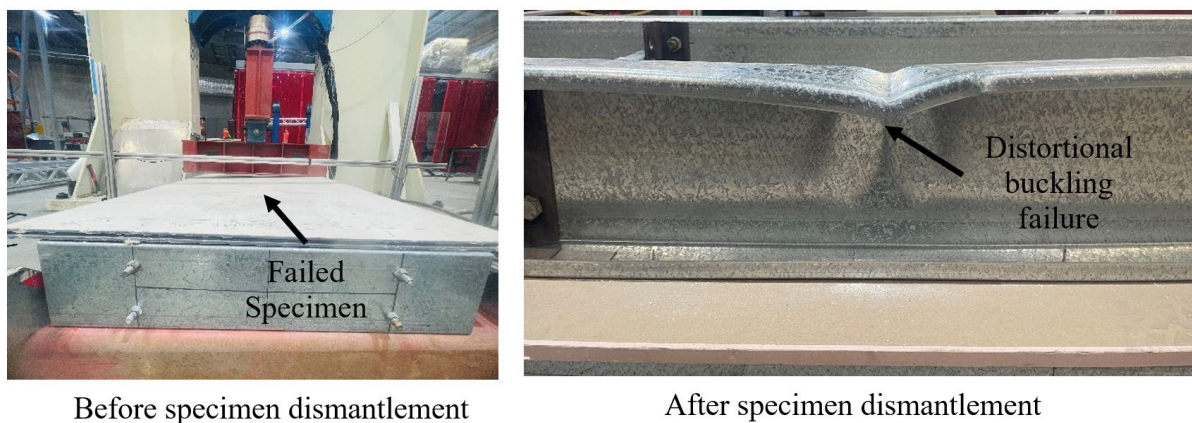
Failure of the channel joists in Specimen FS2
